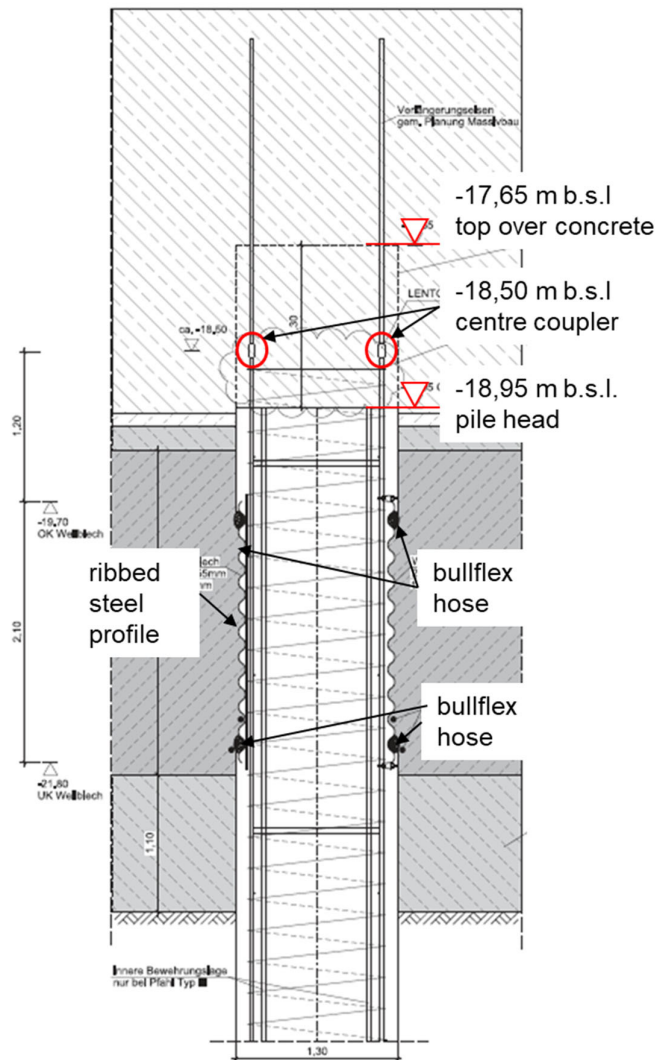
pile head detail of the tensile connection between the bored pile and the under water concrete slab.
